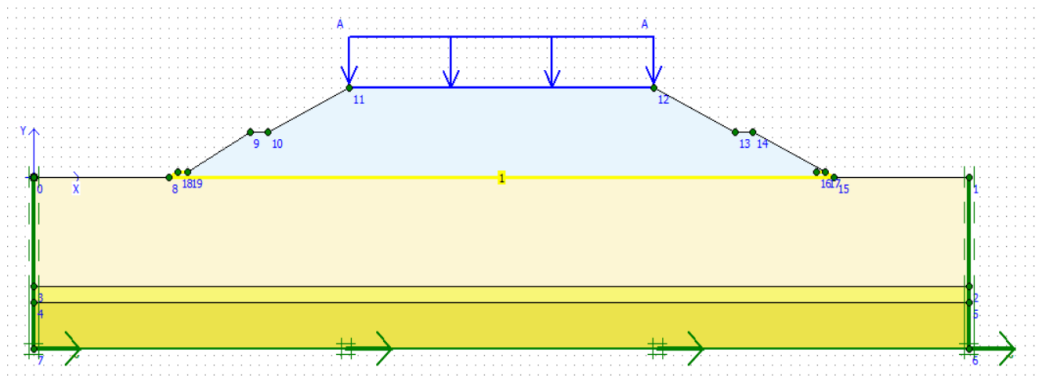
Embankment 1 Trap with Geotextile Reinforcement
